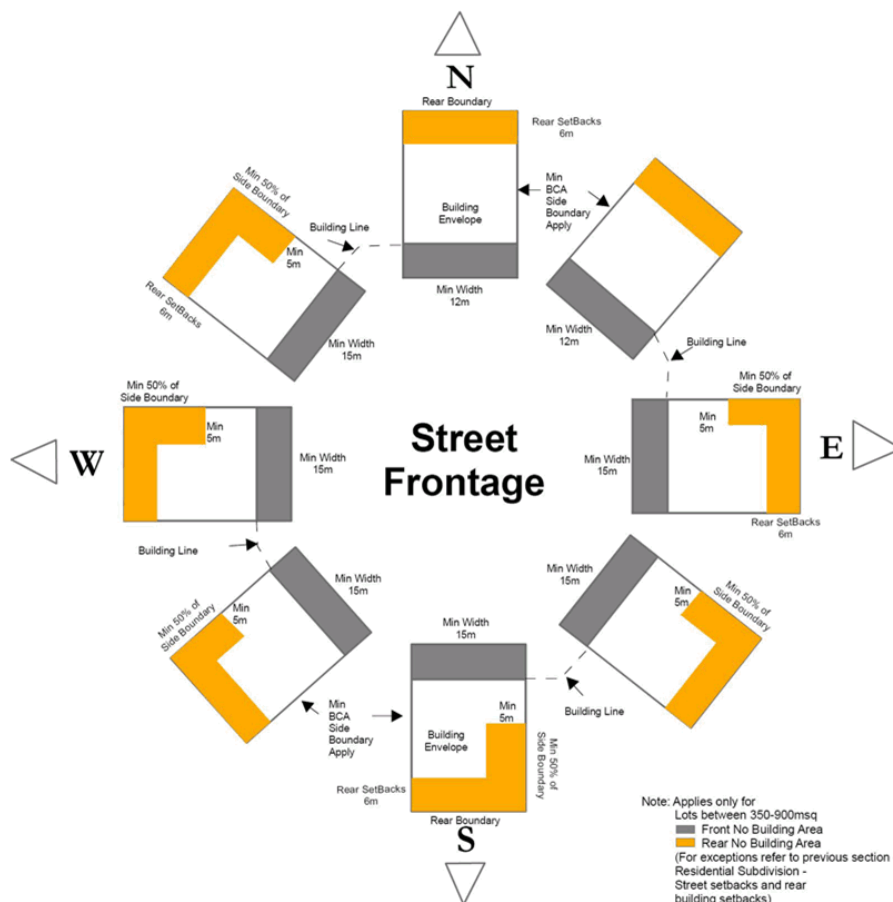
Solar Access Orientation – Minimum Building Envelopes and Lot Widths
